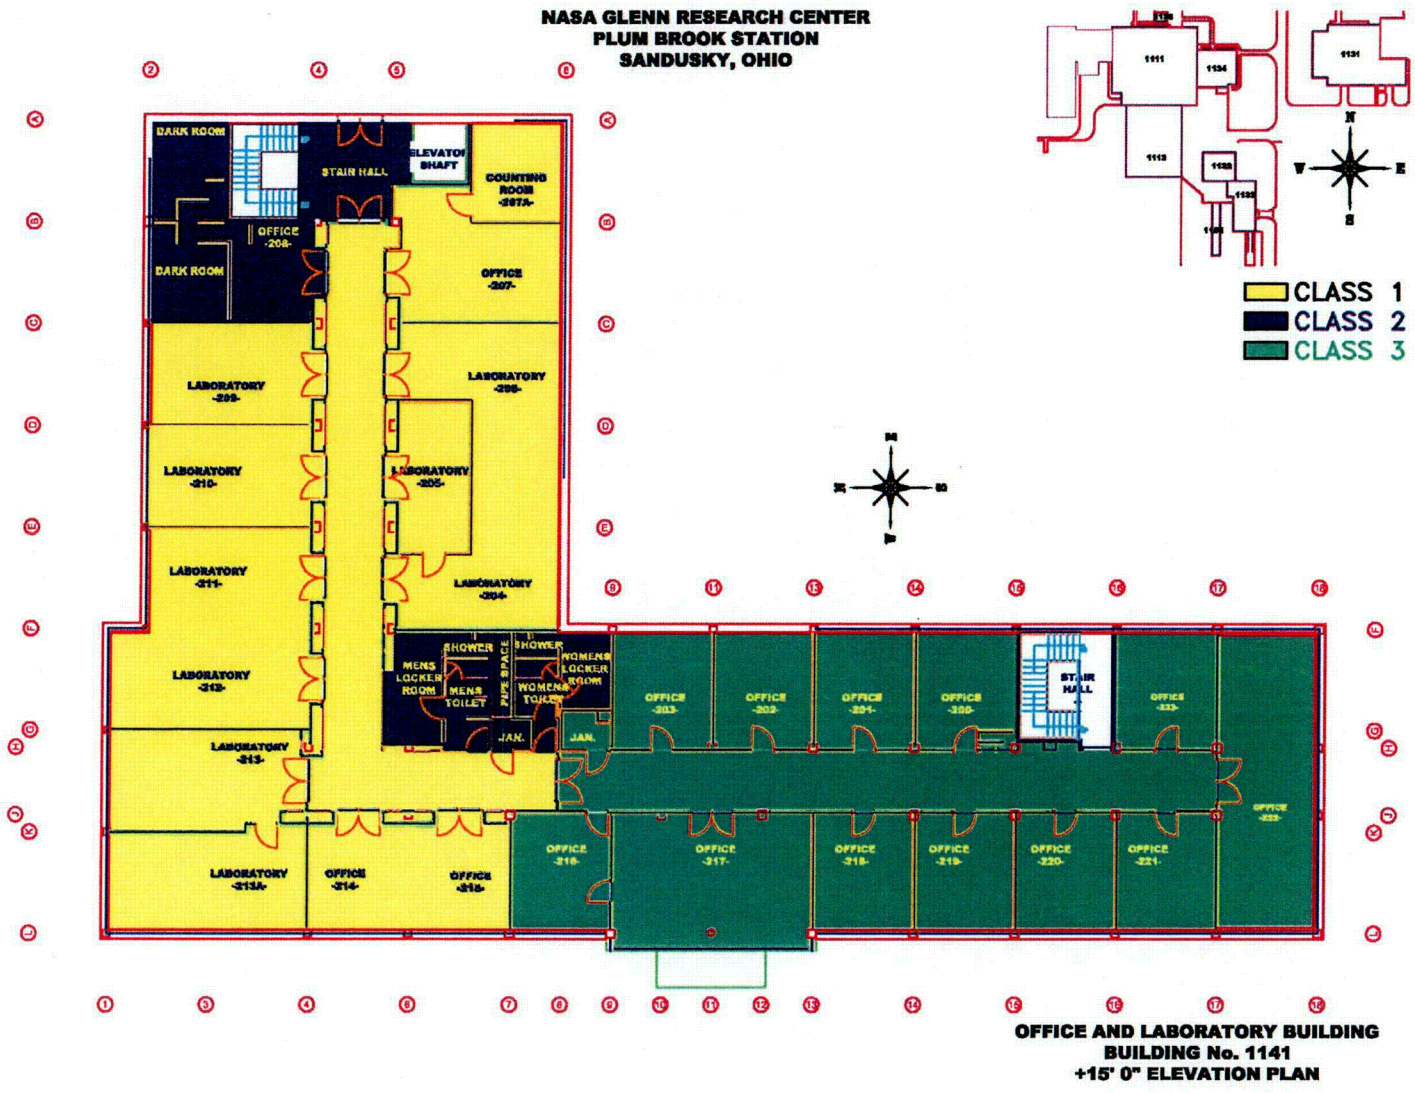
Reactor Office and Laboratory Building 1st Floor Elevation
